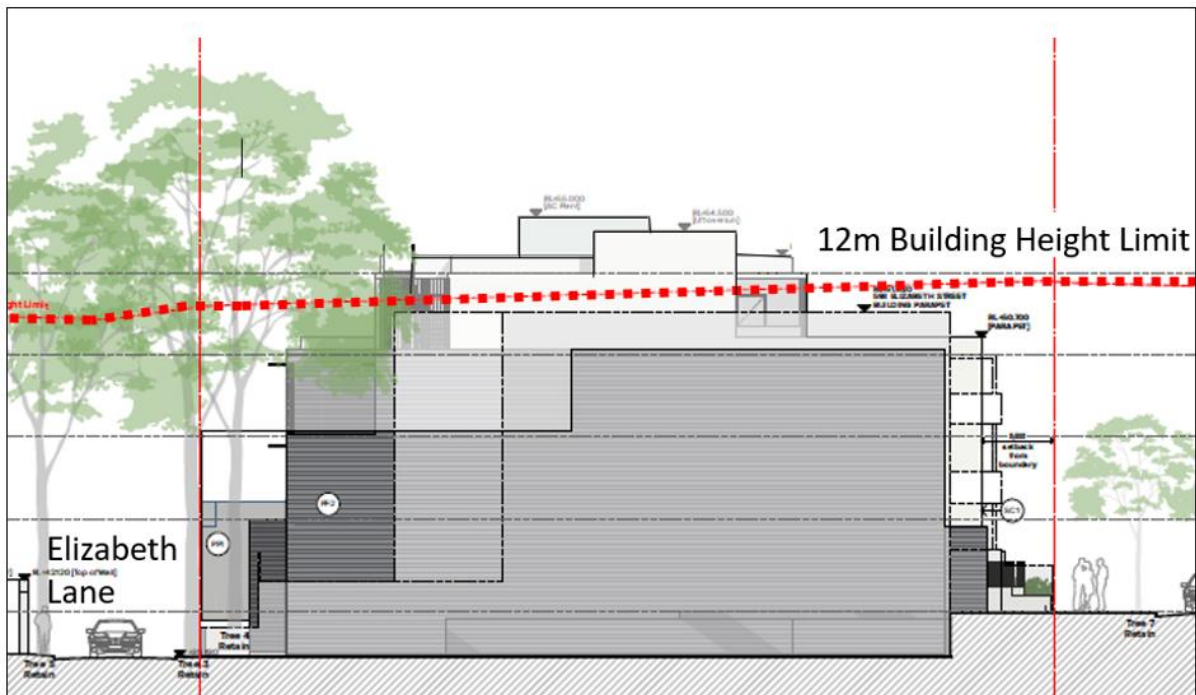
Proposed east elevation (Elizabeth Street) highlighting 12m height limit
